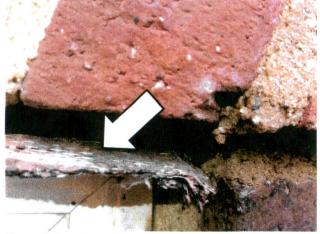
Deteriorated throughwall flashing was observed at the window heads on first floor windows with jack arches.
